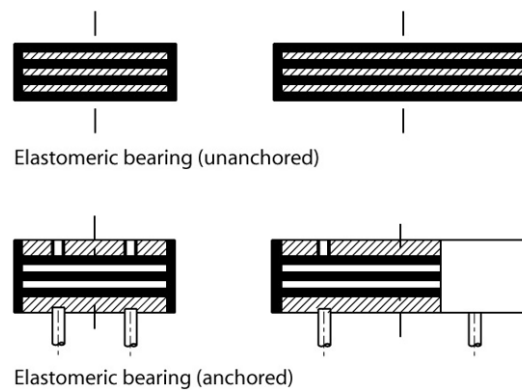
Schematic layout of anchored and unanchored elastomeric bearings [65]
